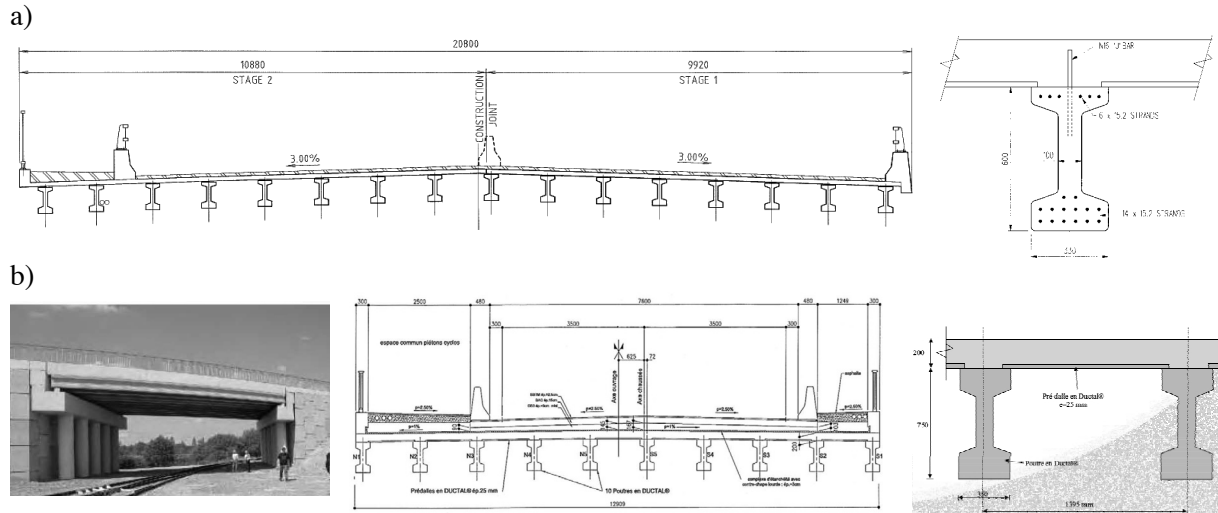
Road bridges with I-shaped UHPFRC girder and thin UHPFRC slabs used as formworks for ordinary RC slab: a) Shepherds Creek bridge: cross section and detail of I-girder and thin slab [Cavill, Chirgwin 2003]; b) Saint-Pierre-la-Cour bridge: view of structure and cross section [Resplendino, Bouteille 2006]
